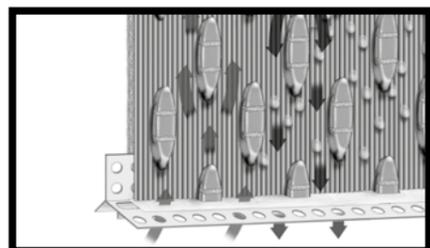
KERLITE 3plus and KERLITE 5plus can be installed directly on the CeroVent® Gutjahr® system. This system allows for wall installation (walls featuring salt and rising damp, damaged facades, mixed supports, prefabricated materials, etc.) and offers microventilation and uncoupling from the substrate.
